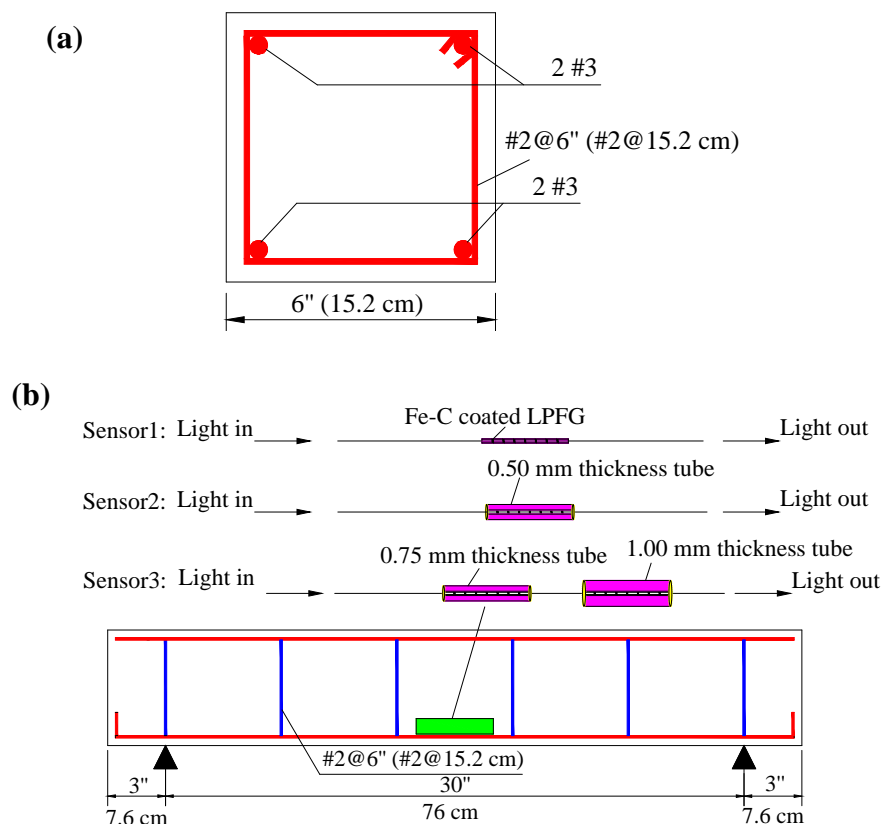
RC beam specimen and instrumentation:(a) cross section (b) reinforcement detail and instrumentation plan.
